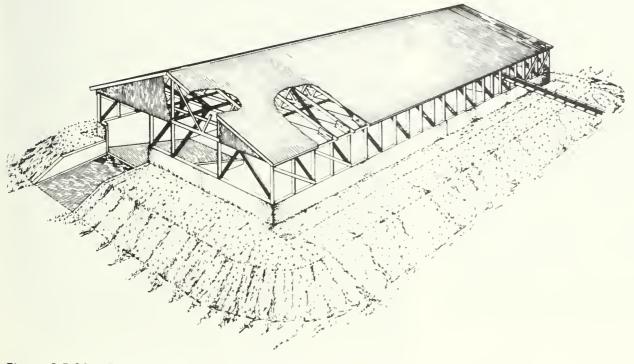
Rectangular roofed storage for semisolid manure (CPS Plan 2705)
